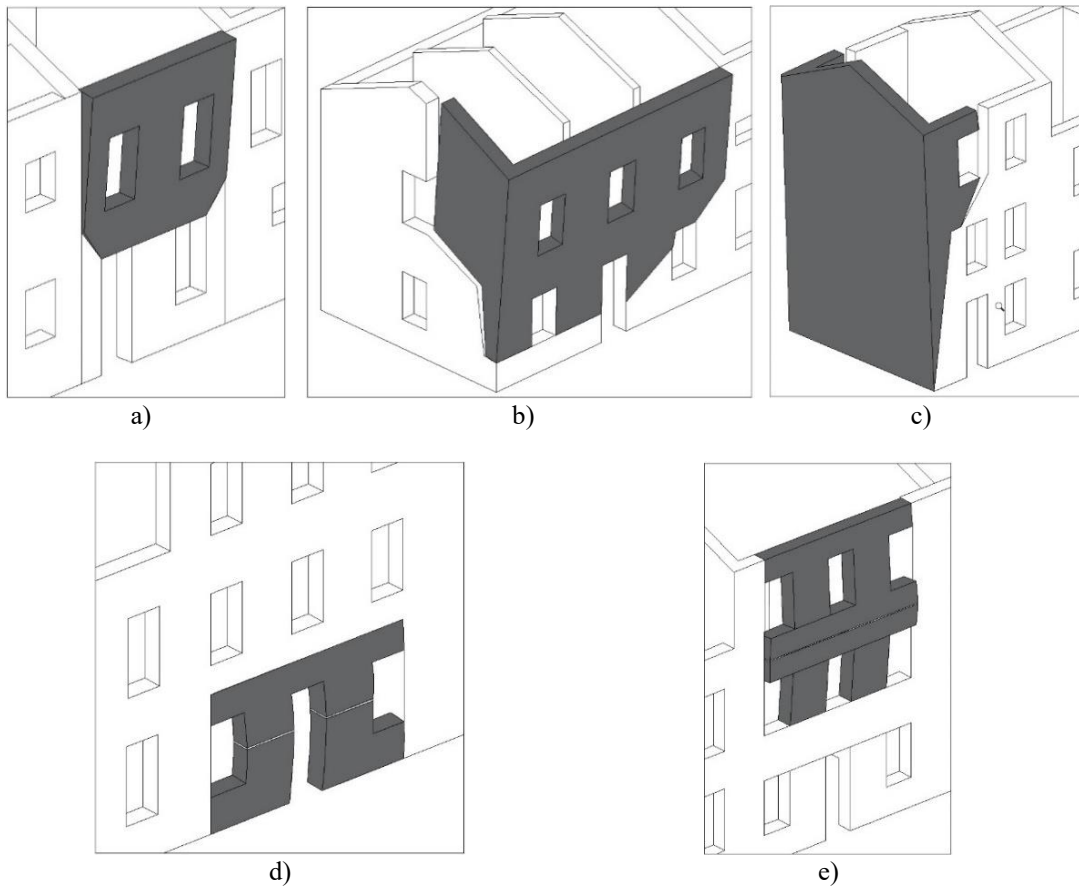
example of out-of-plane wall overturning in unreinforced masonry buildings (D'Ayala and Speranza, 2003): a) overturning of a wall at first-floor b) partial overturning of the facade, c) total overturning of the facade, d) flexural mechanism of a wall, e) flexural mechanism of the façade.
